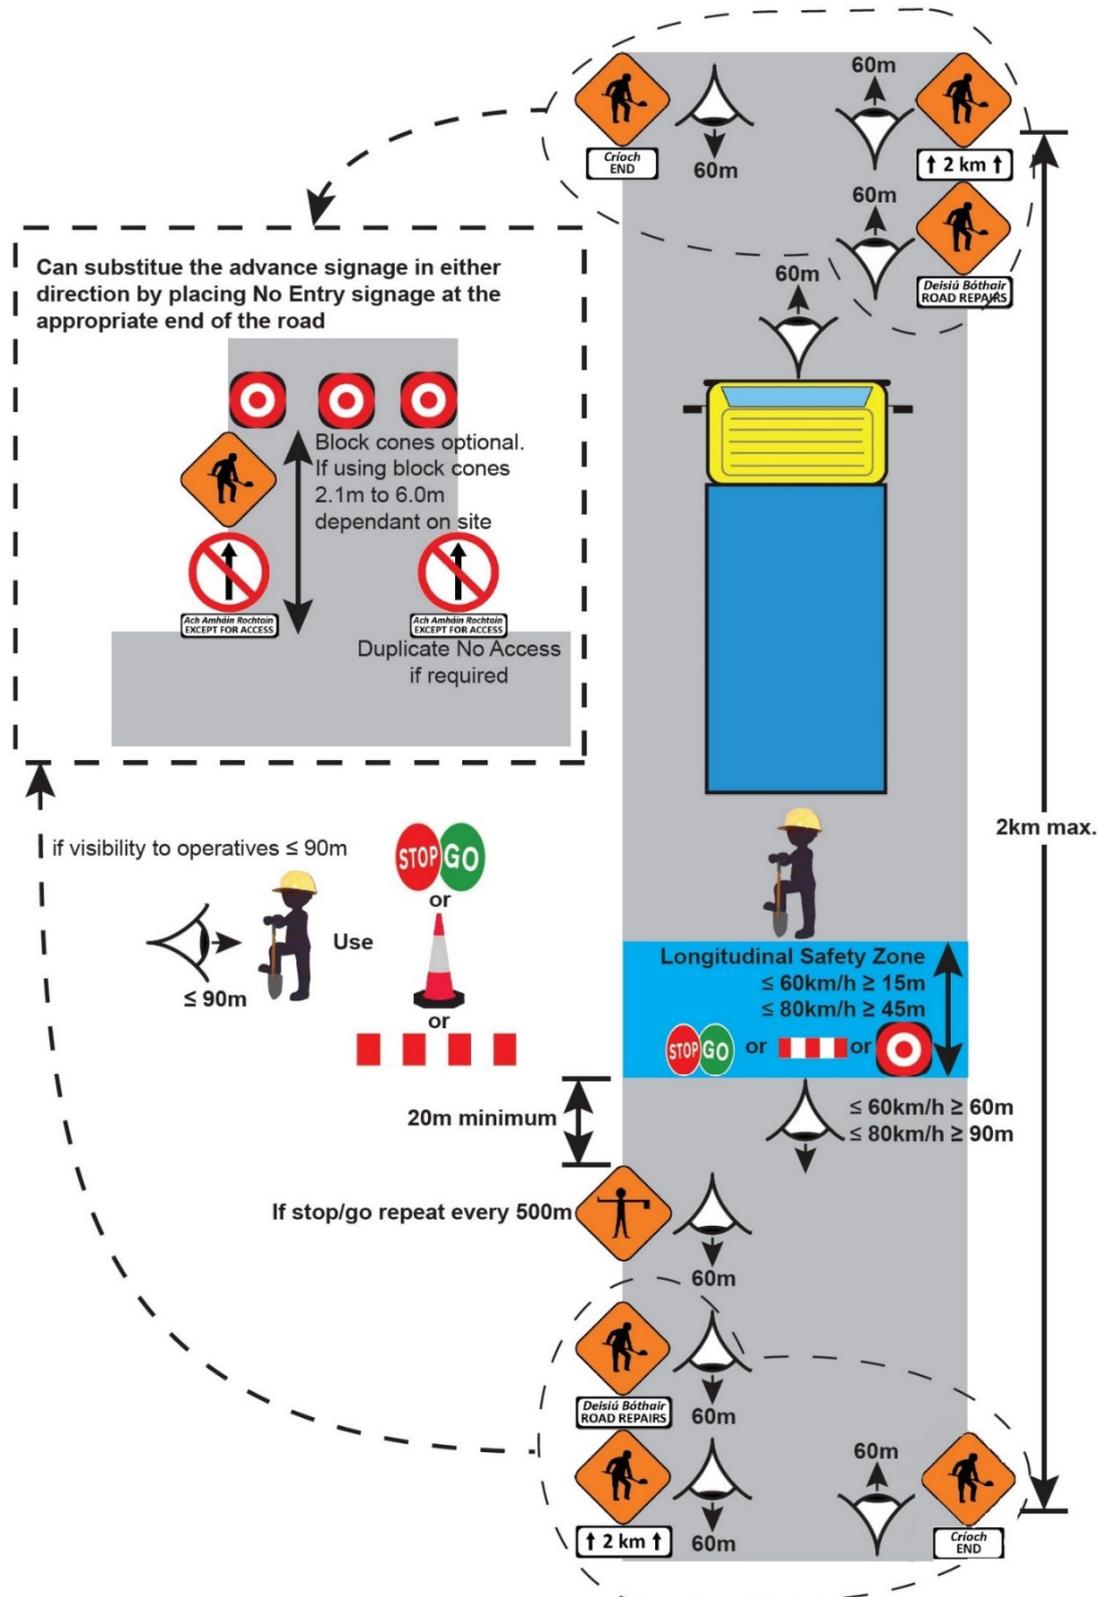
Semi-Static Layout with Unobstructed Road Width < 2.5m
